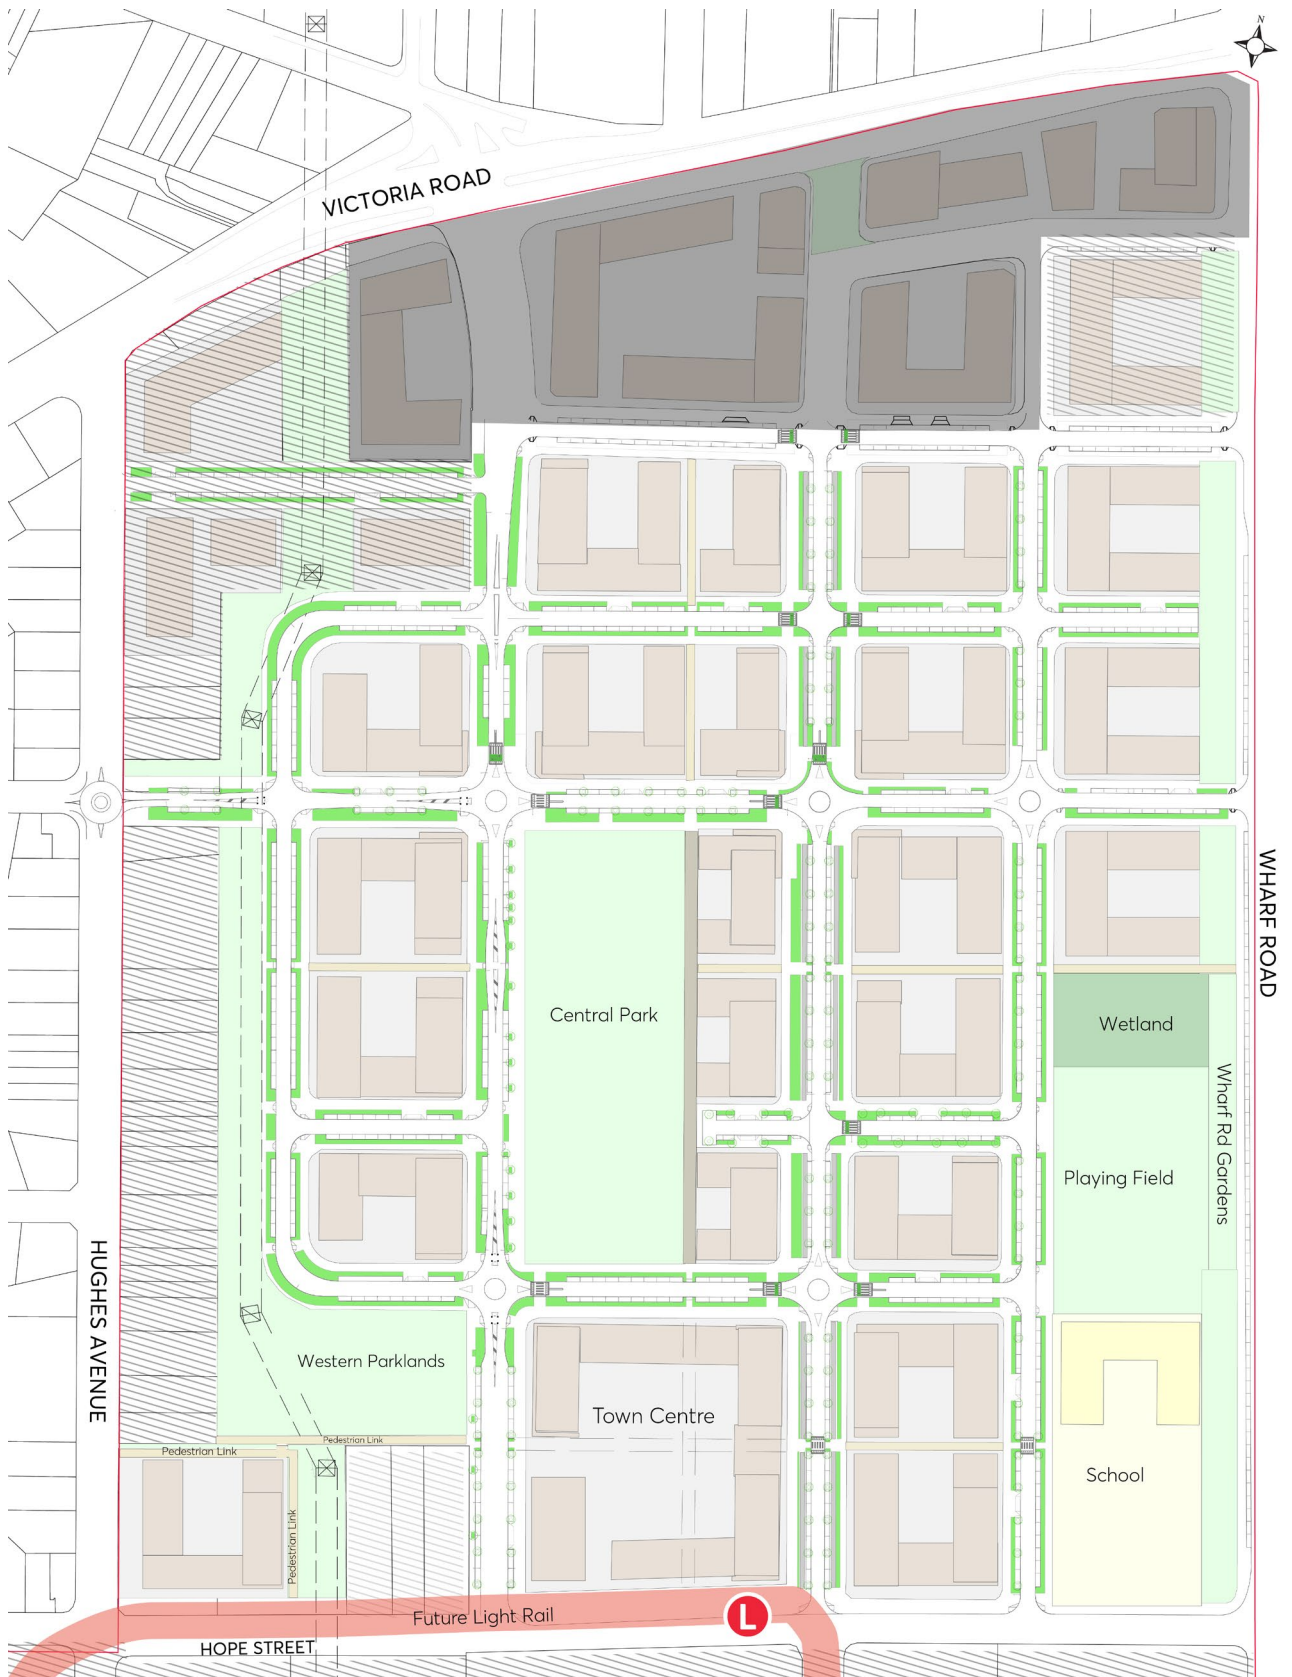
Public Domain Plan - Melrose Park North
